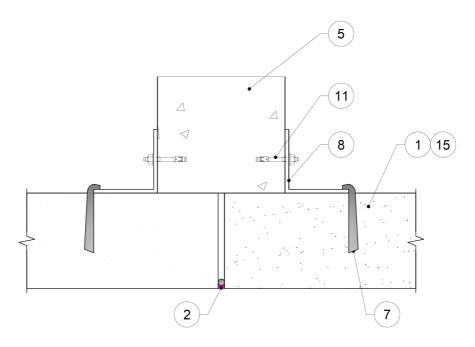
Plan Section at Vertical Concrete Column – Hebel Ties
